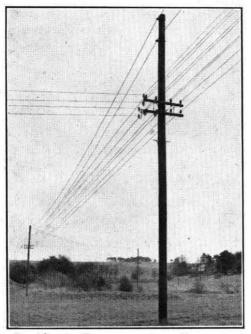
AN ENAMPLE OF JOINT TELEPHONE AND LOW-VOLTAGE POWER-LINE CONSTRUCTION.
